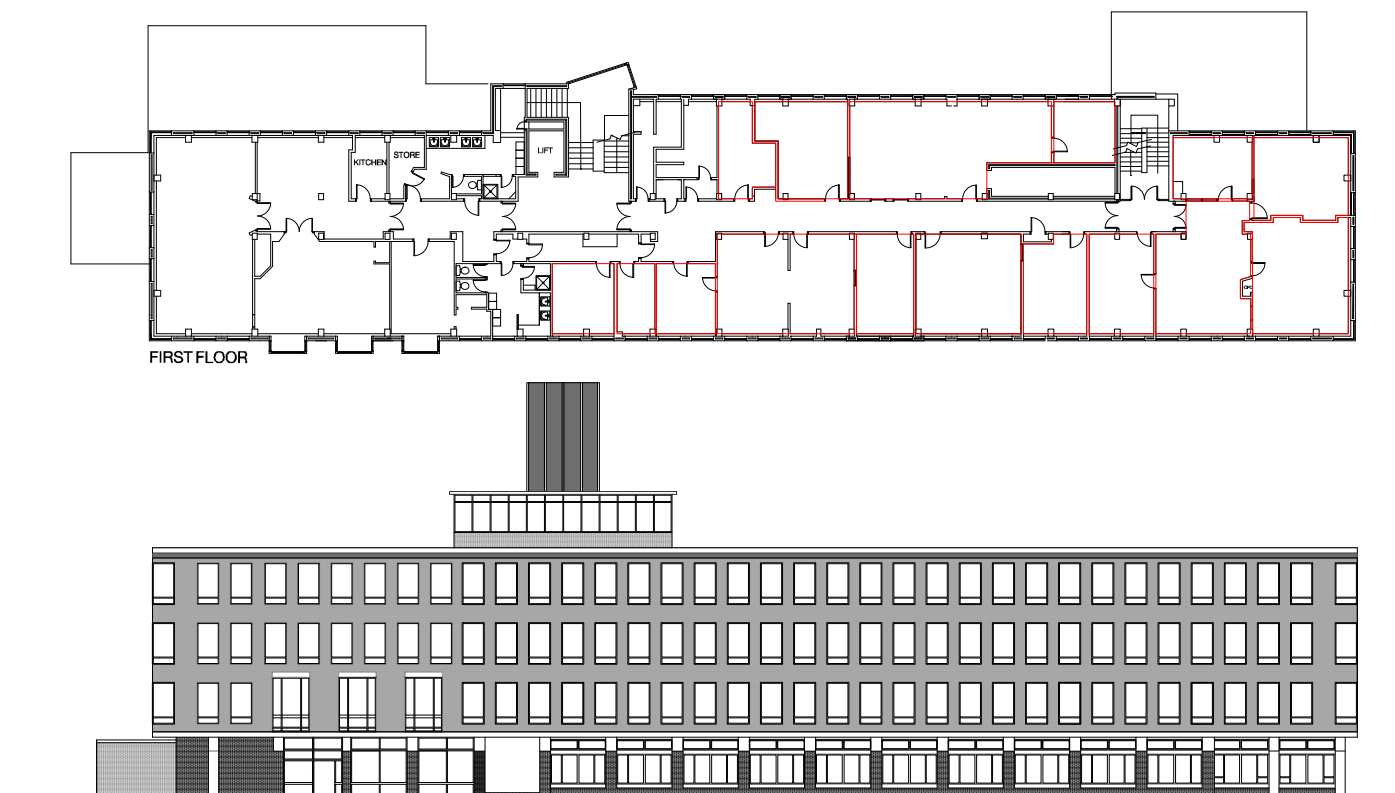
CAD plans and elevations of the existing building (provided by Dorset Council)
